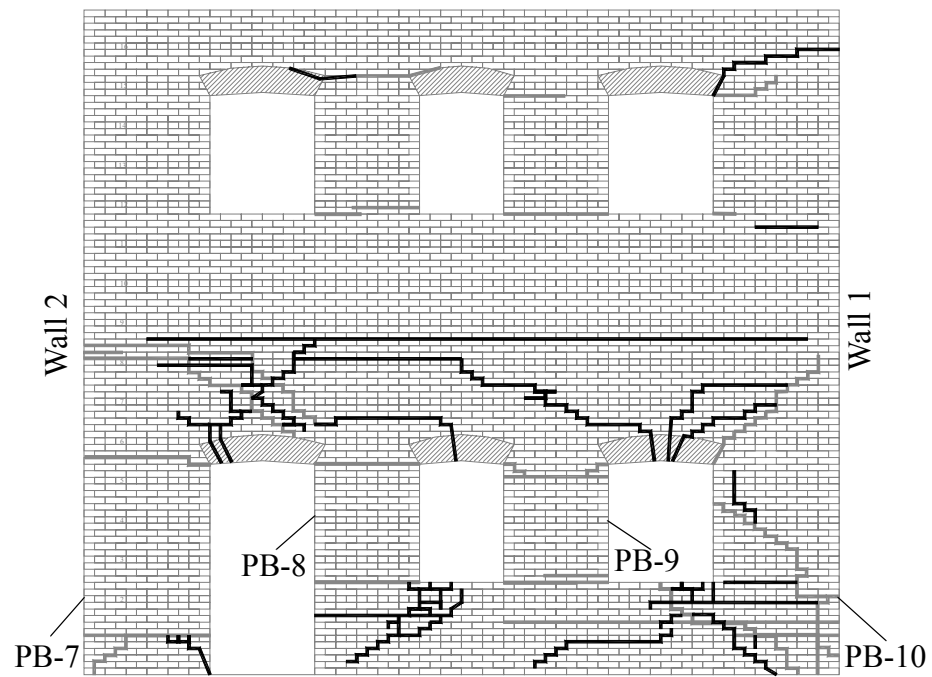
Crack pattern in Wall B following Test Run 41.
